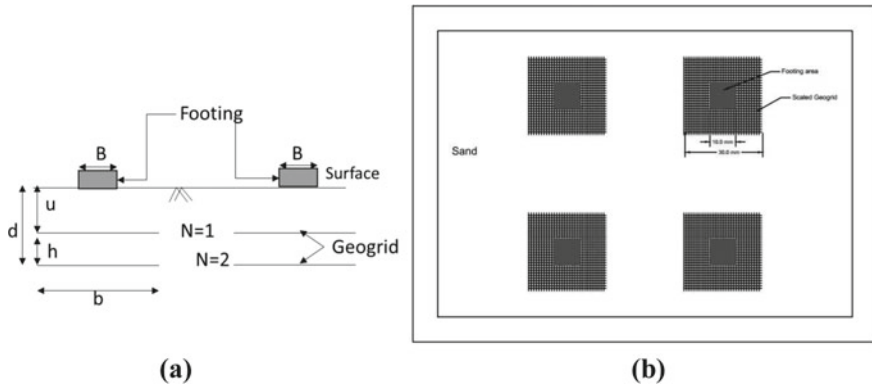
Geogrid placement details in the sand bed: a vertical cross-section and b horizontal cross-section
